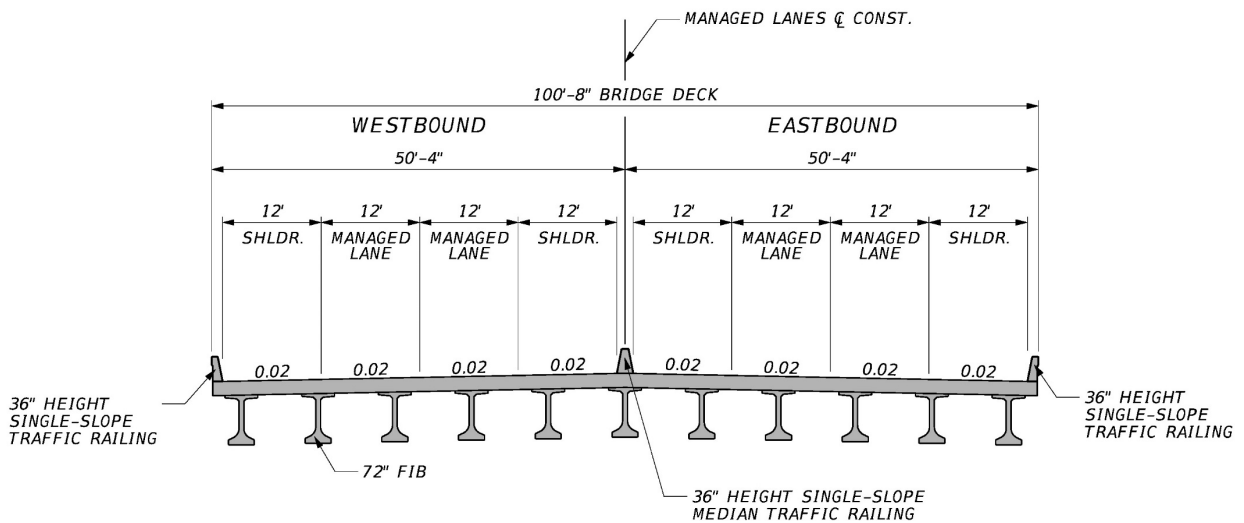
and 6.1.12 display the conceptual typical section for the super and substructures of the bridge over Powerline Road and Quiet Waters Business Park access road.
